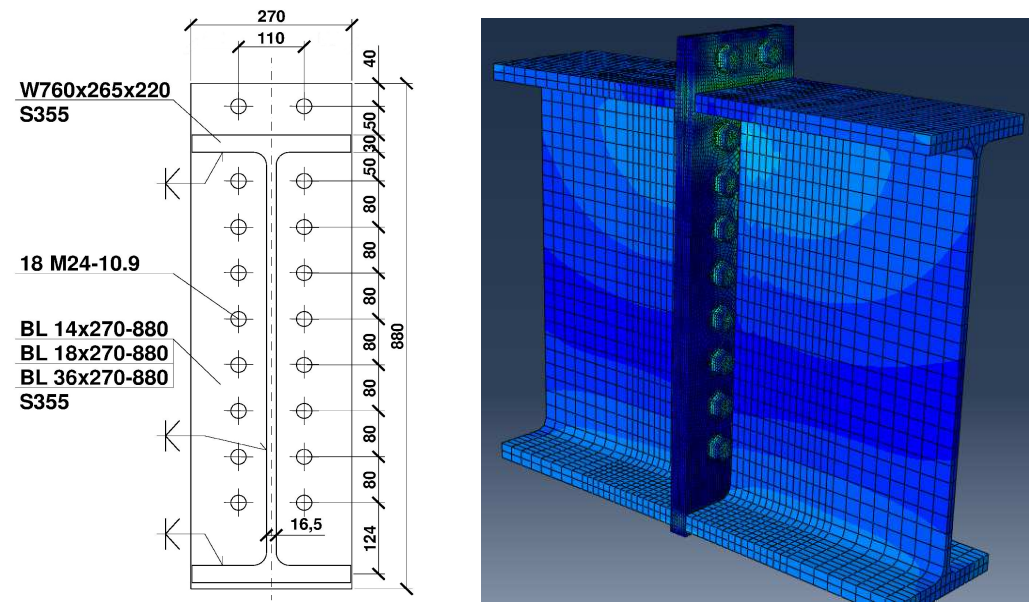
Schema and MES model of investigated beam splice (it is partial strength bolted connection of beam loaded in elastic range)
